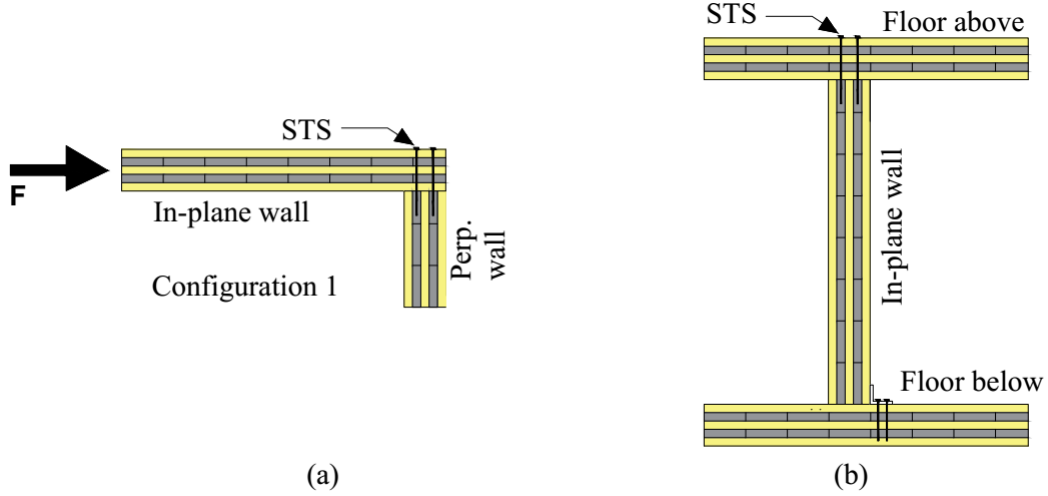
(a) wall-to-perp. wall connections and (b) in-plane wall-to-floor connections
